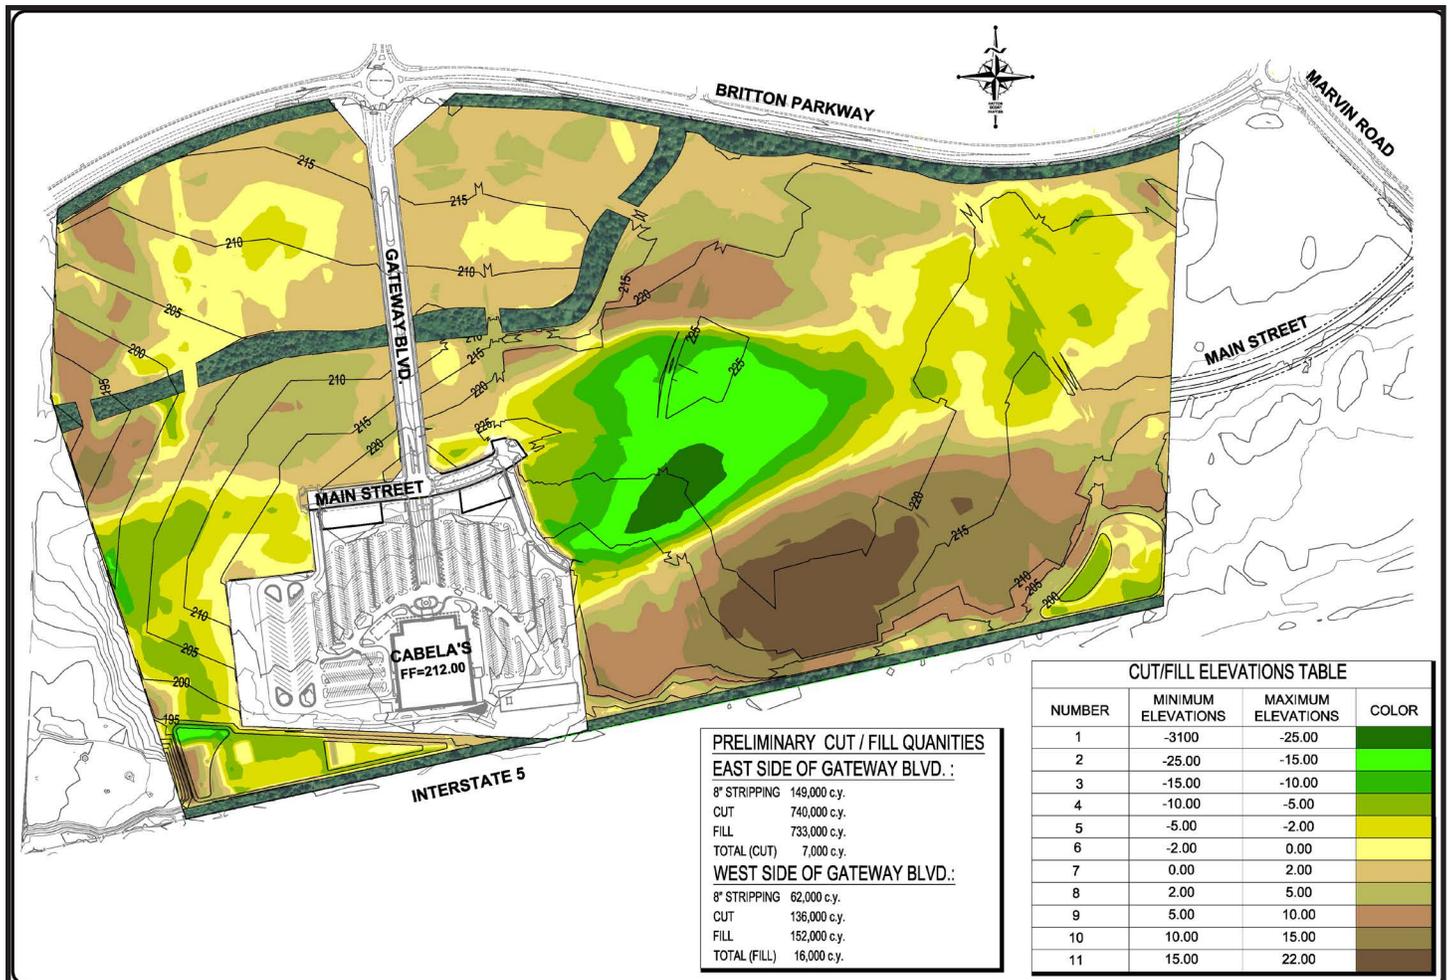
Lacey Gateway Town Center conceptual grading plan
